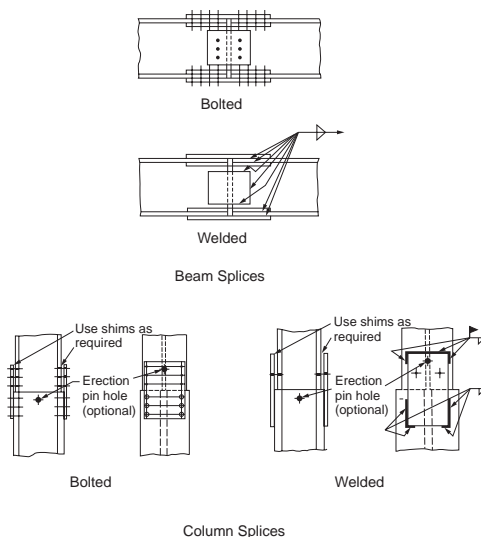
Bolted and welded beam and column splices.
